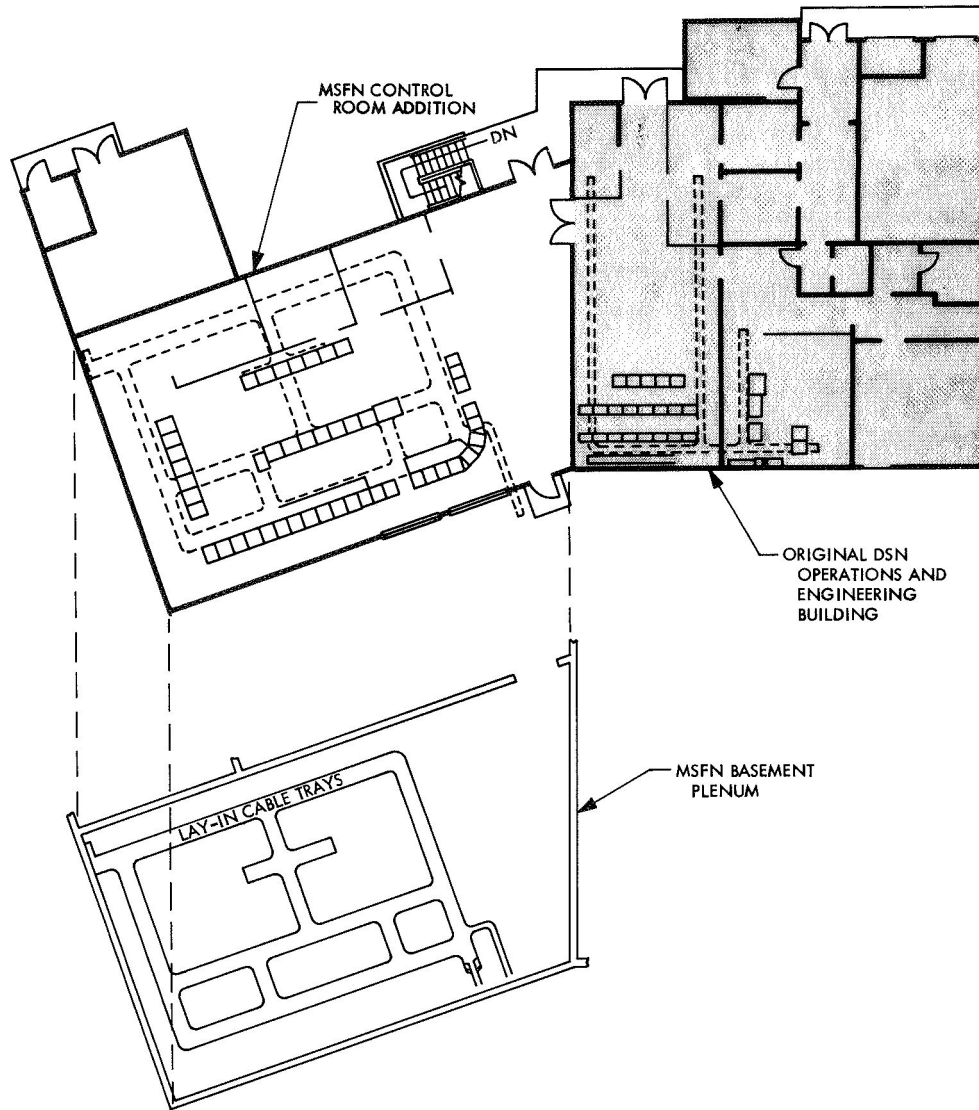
Manned Space Flight Network control room floor plan at Pioneer site
